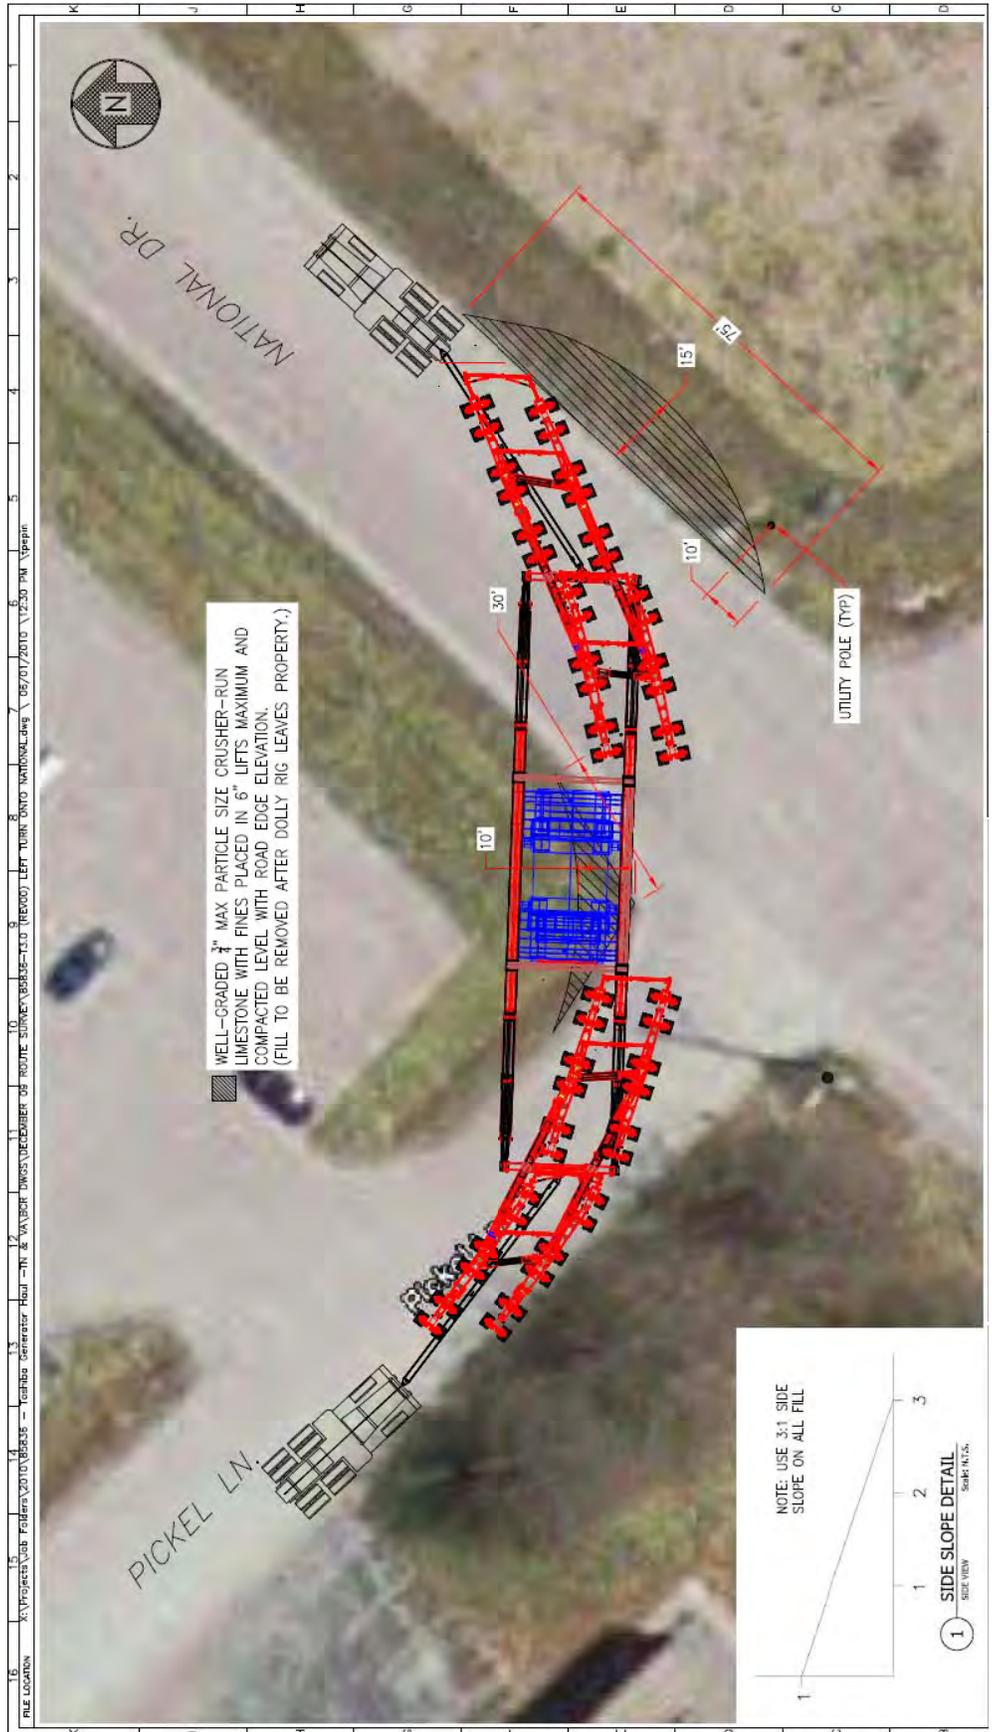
Civil Improvements Proposed at Intersection of Pickle Lane and National Drive in Knoxville, Tennessee
